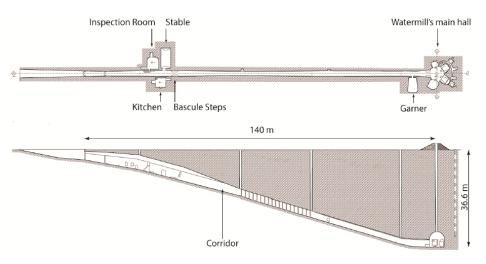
Plan and section of Mohammadabad double-stone watermill, Meybood [5]
